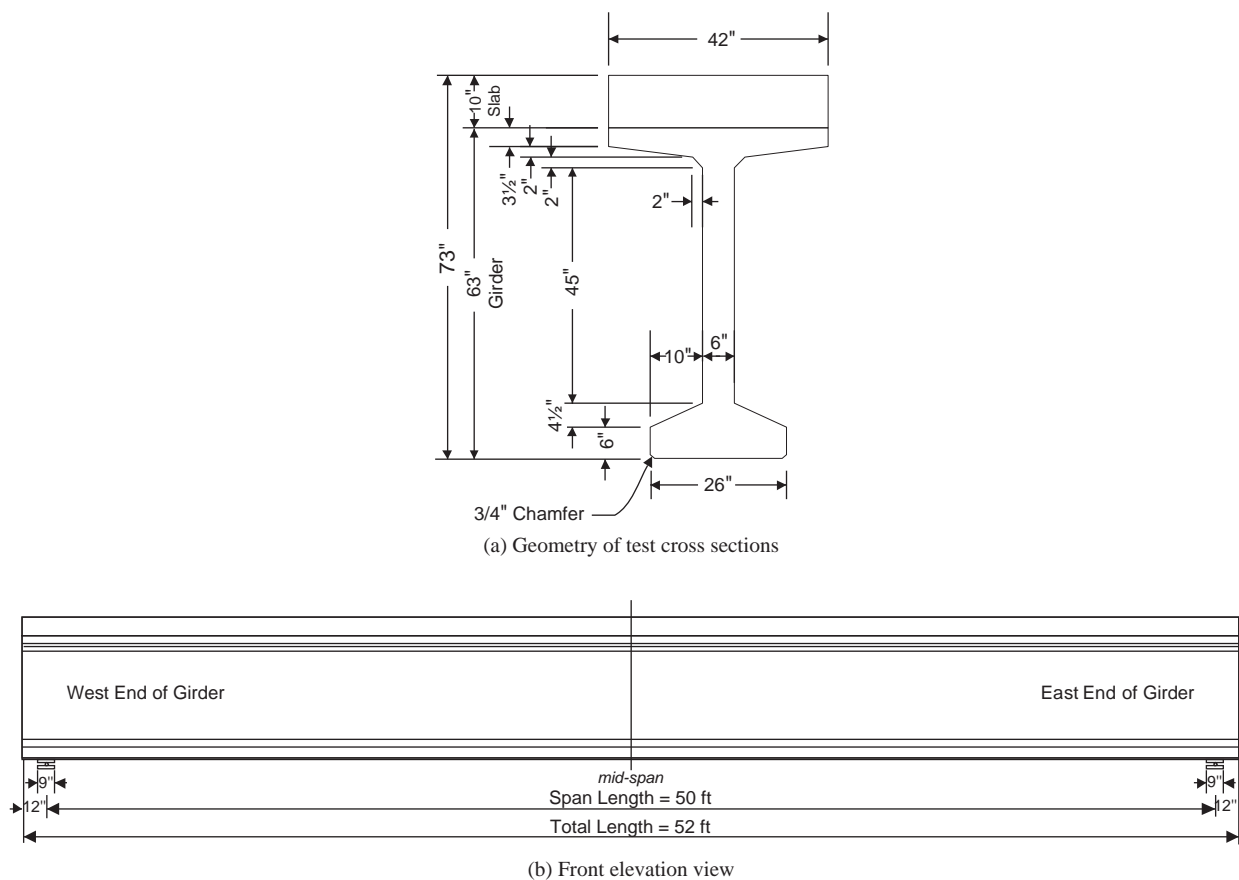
Geometry of 63-inch bulb-tee girders with slabs.
